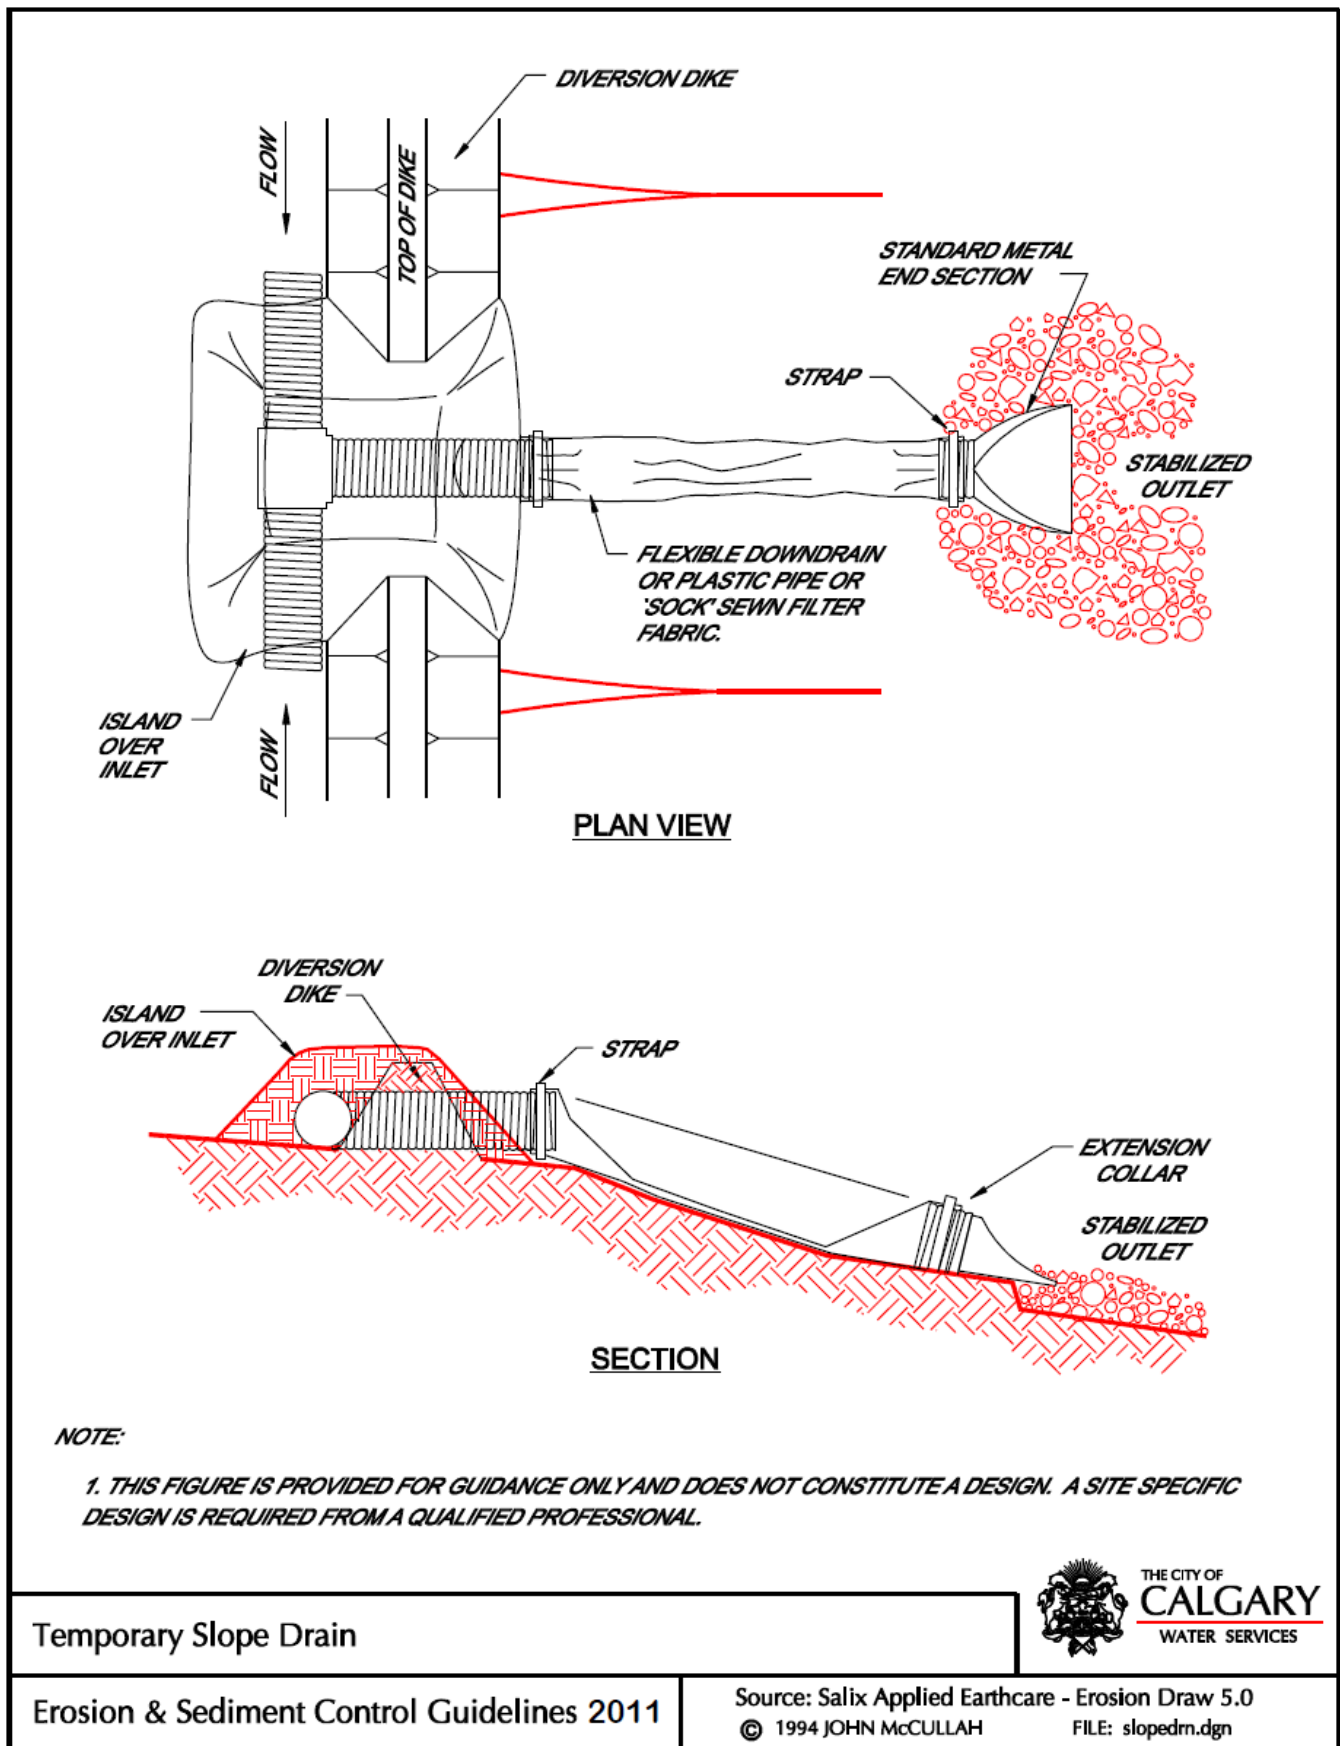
Typical Installation Detail for Temporary Slope Drain
